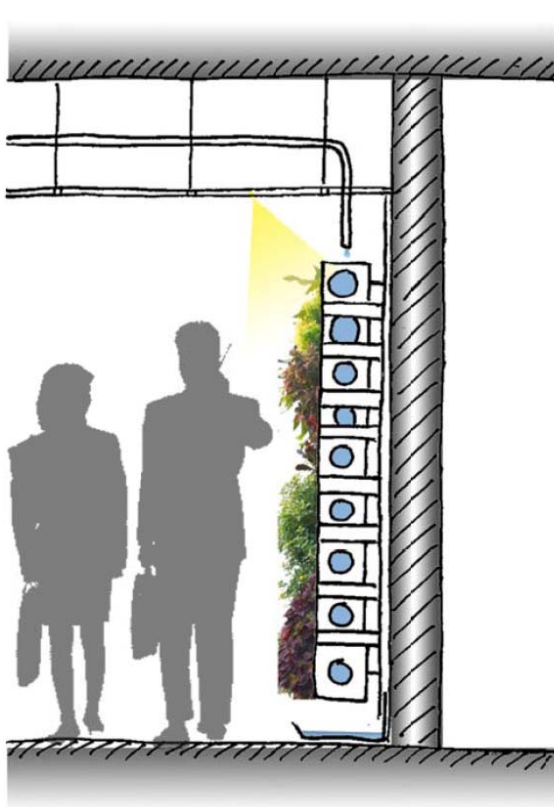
Section Diagram of Vertical Garden at Elevator Hall (Diagram prepared by Takao Ugai)
